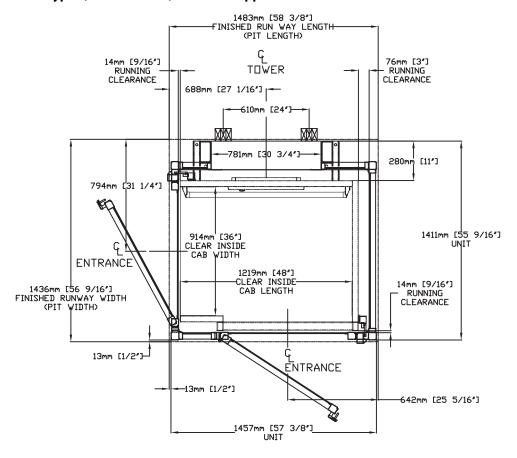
Plan View - Type 4, 36" x 54" Cab, Hoistway Application
